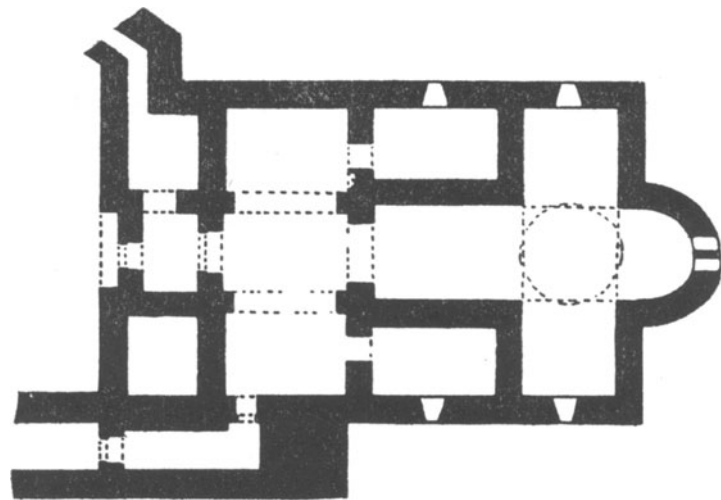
CHURCH AT MAHALETCH, ANATOLIA. PLAN
